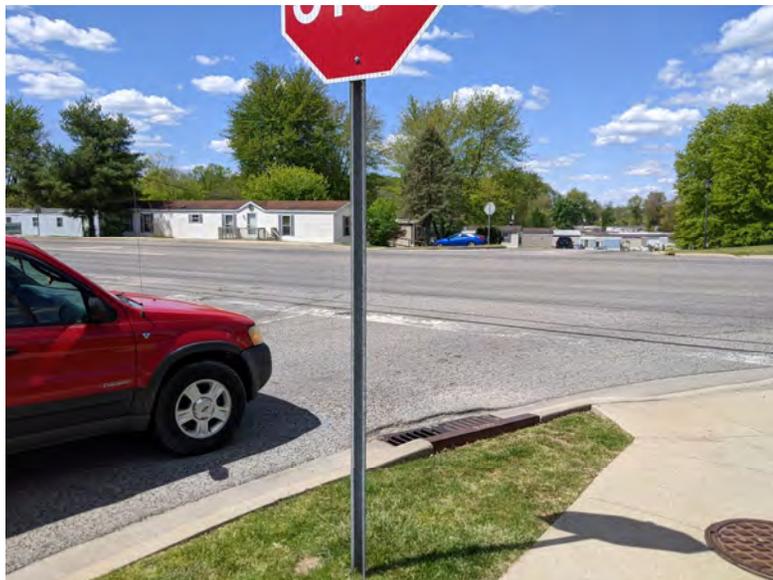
Area of proposed trail at intersection of Constitution Way and S Curry Pike, looking west.
